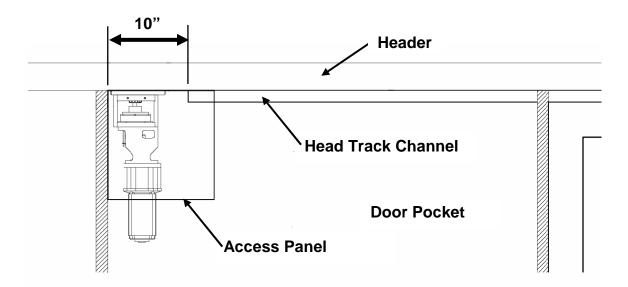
<u>Side View</u> of Clearance Needed for Motor Assembly Installation Inside Door Pocket
